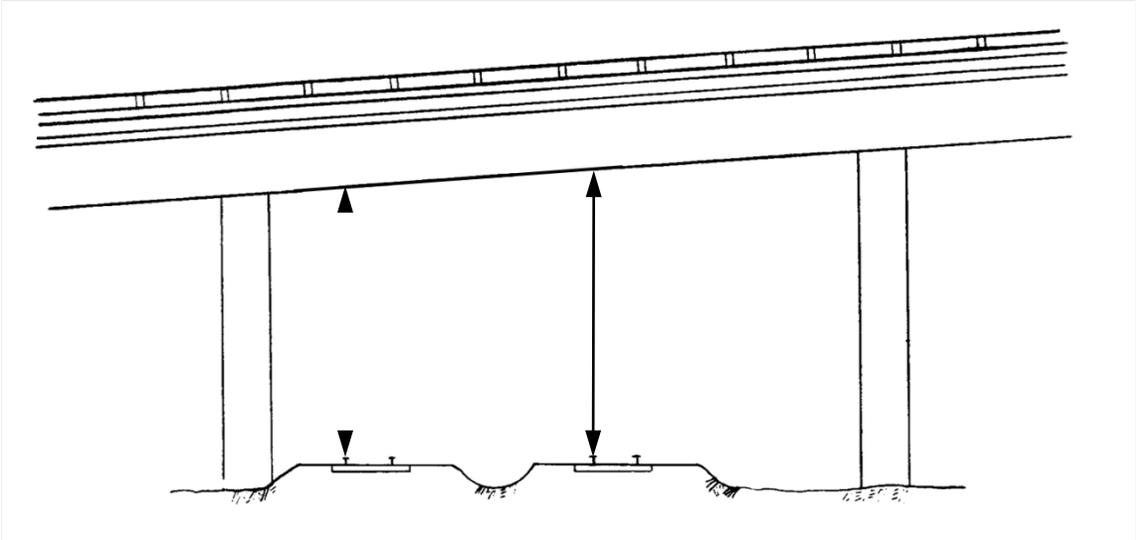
Bridge elevation view with an electrified passenger rail track and a non-electrified passenger rail track below the bridge.
